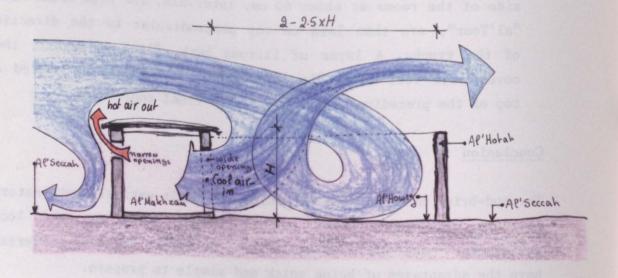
A sketch that shows the natural ventilation of the mud-brick house
